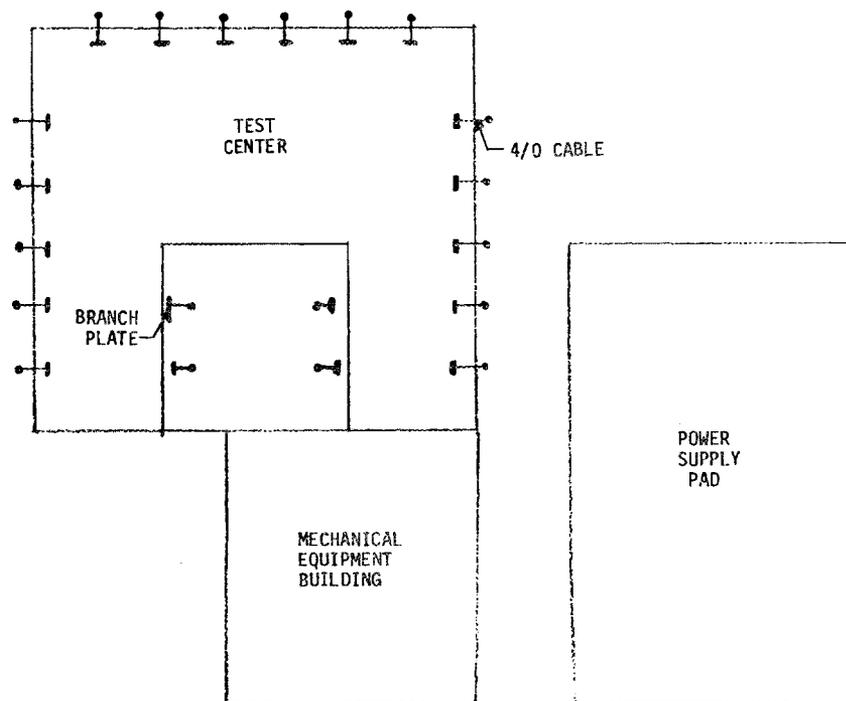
GROUND SYSTEM BRANCH PLATE LAYOUT - TEST CENTER - LEVEL ONE
